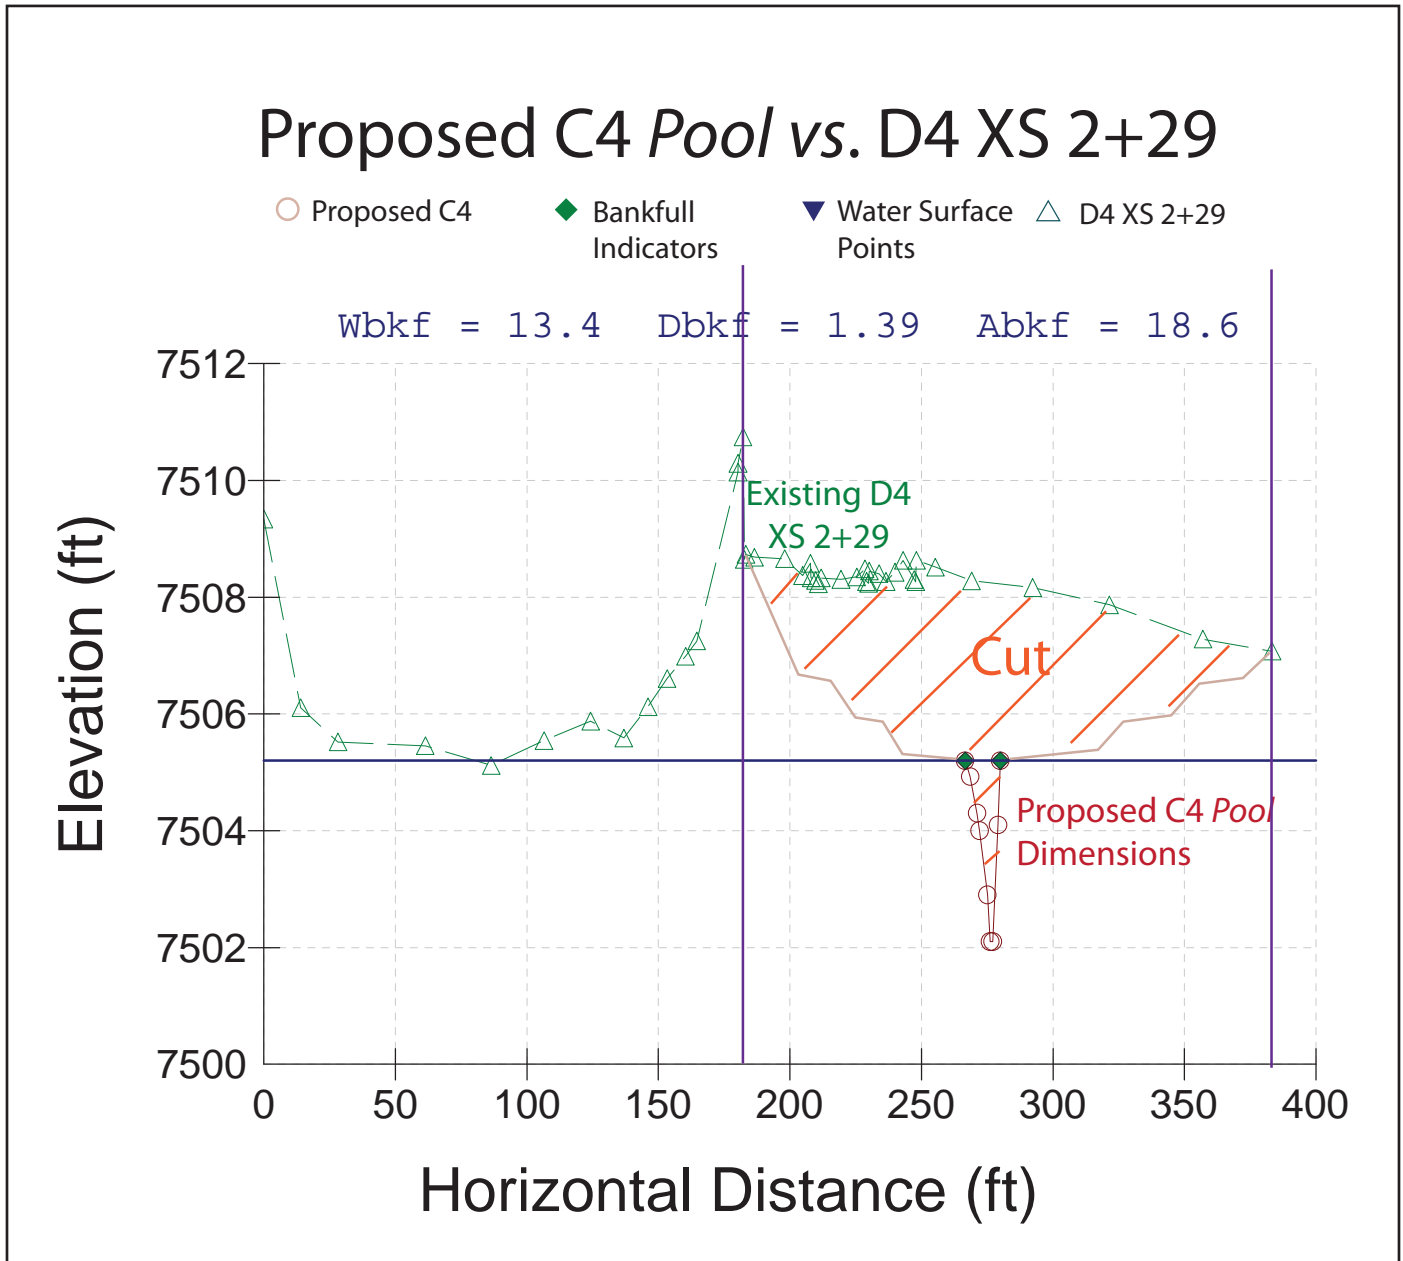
The proposed C4 *pool* cross-section compared to the existing D4 cross-section 2+29 below the West Creek road.
